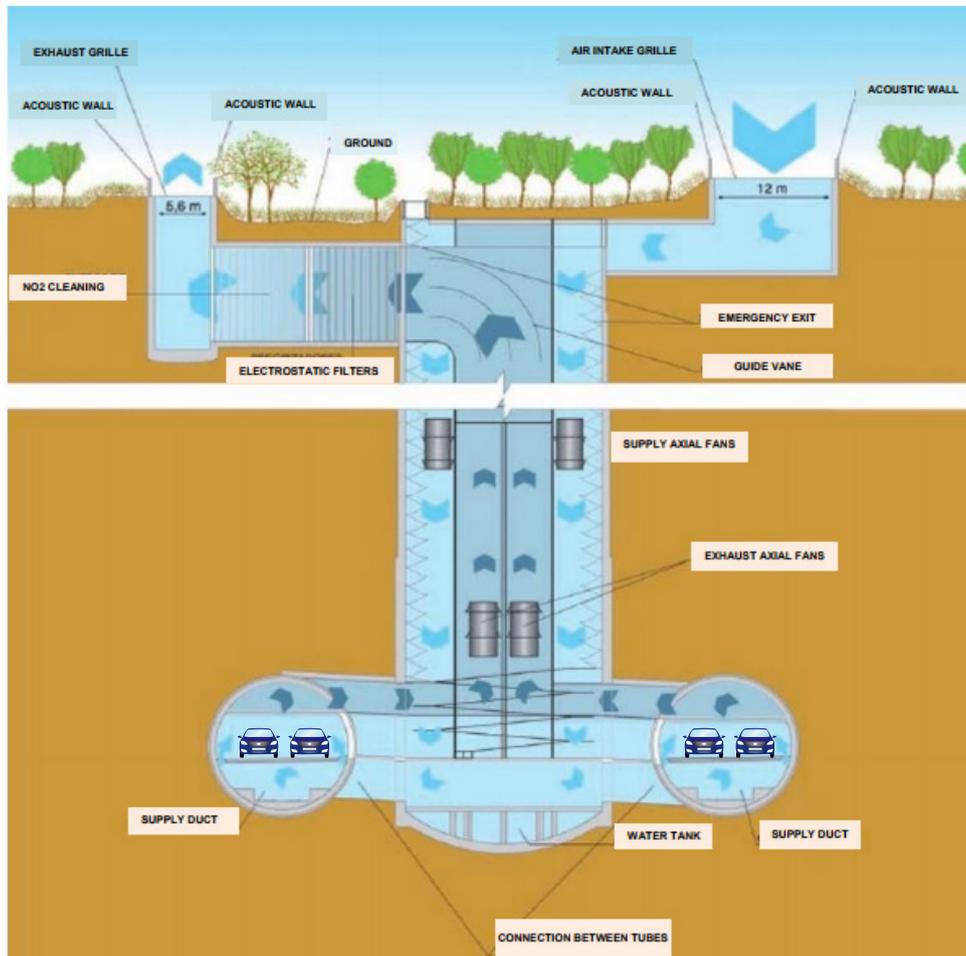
Sketch of a ventilation station in the By-pass Sur tunnel of the Calle 30 (picture modified from reference)²⁴
